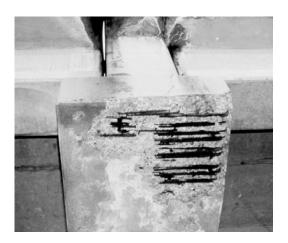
Corrosion of Original Pierce Street Elevated Bent Caps
